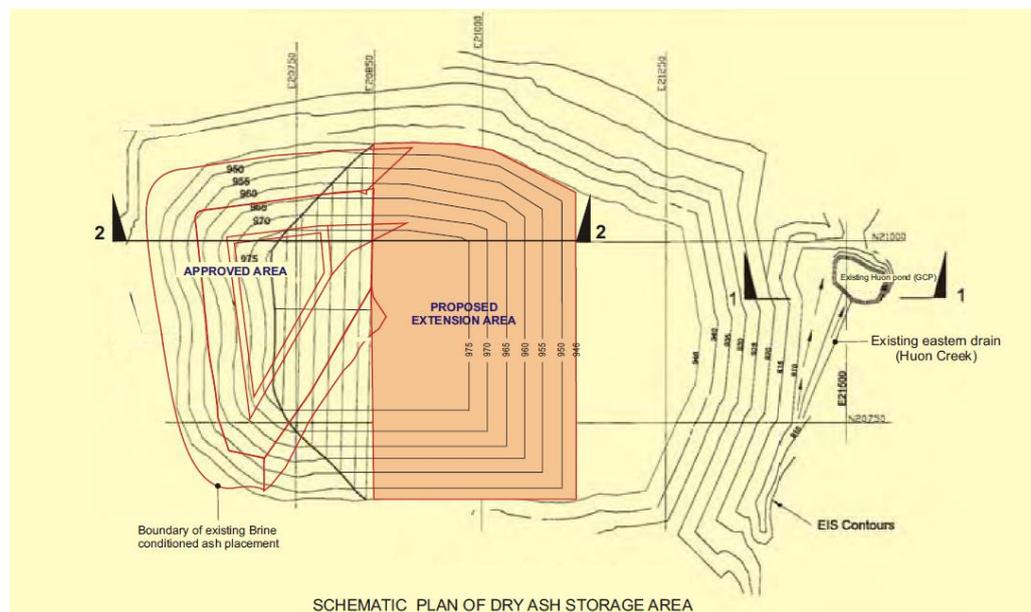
Mt Piper Ash Repository – Plan layout (from Connell Wagner 2007).
